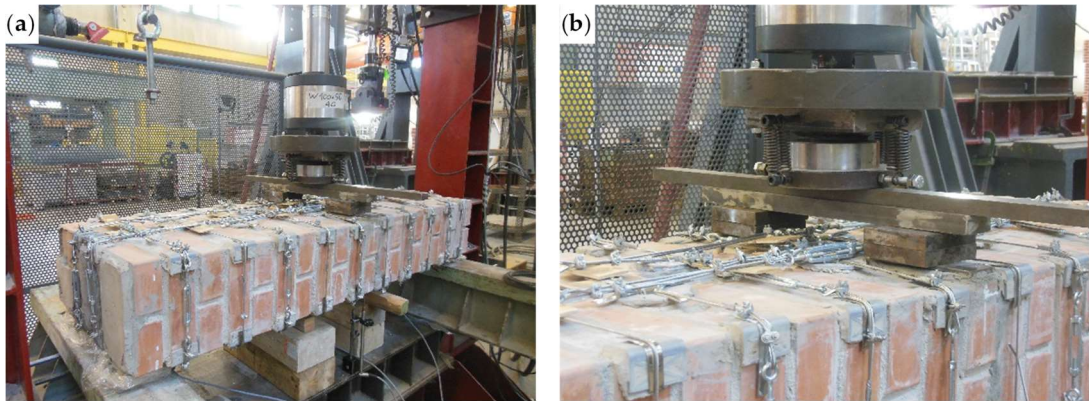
The flat steel bars for load distribution on the middle cross-section: (a) overview of the loading system and (b) detail of the passage of the steel wire ropes under the loading piston.
